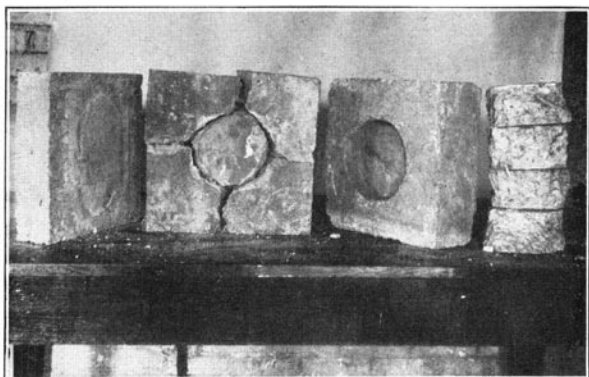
VIEW SHOWING RECESSED BLOCKS AFTER FAILURE.
